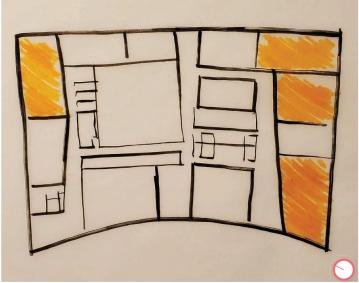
AUTHOR'S SKECTH OF SECOND FLOOR PLAN
